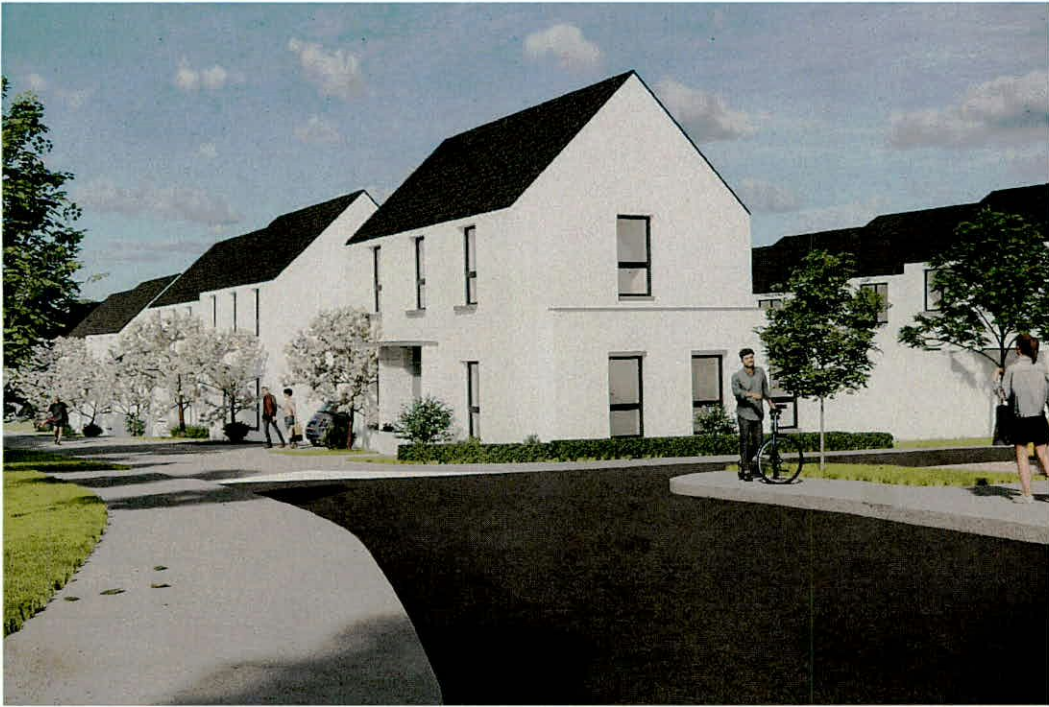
View from Access Road off Upper Main Street, Newcastle
